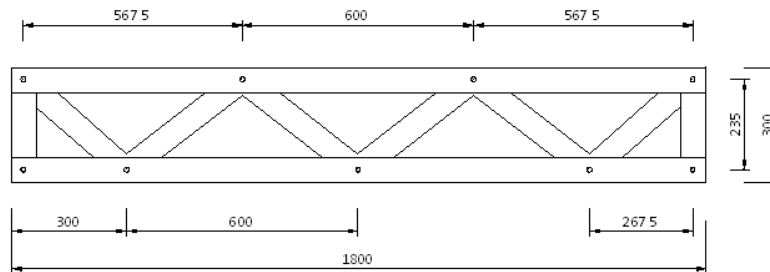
Typical Dimensions of Truss Specimens with HRCs at Connections
